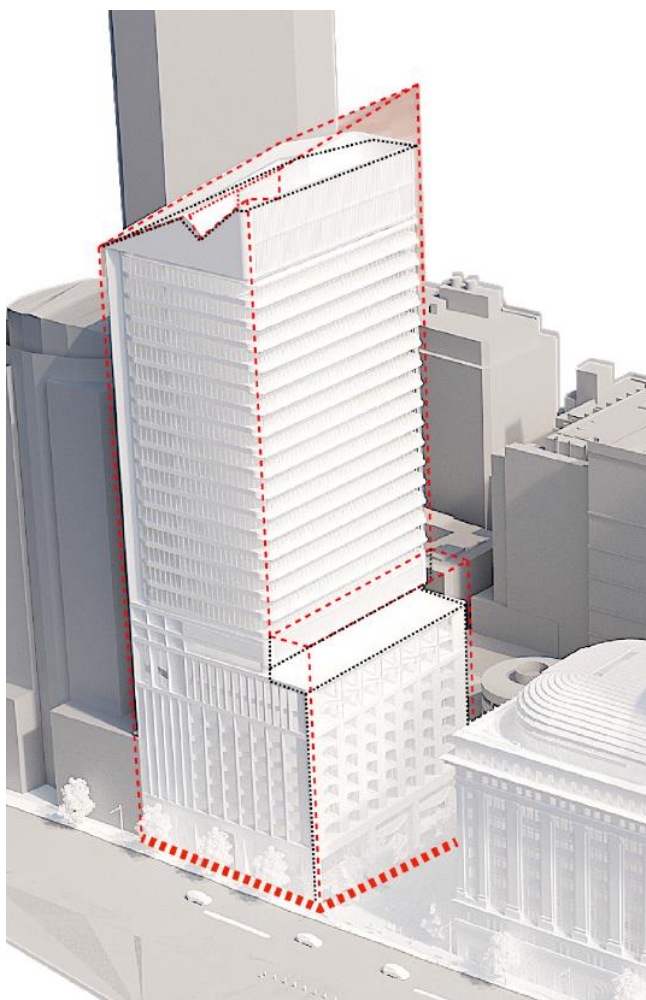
South Site proposal within the building envelope (as proposed to be amended by SSD 18_9347)
